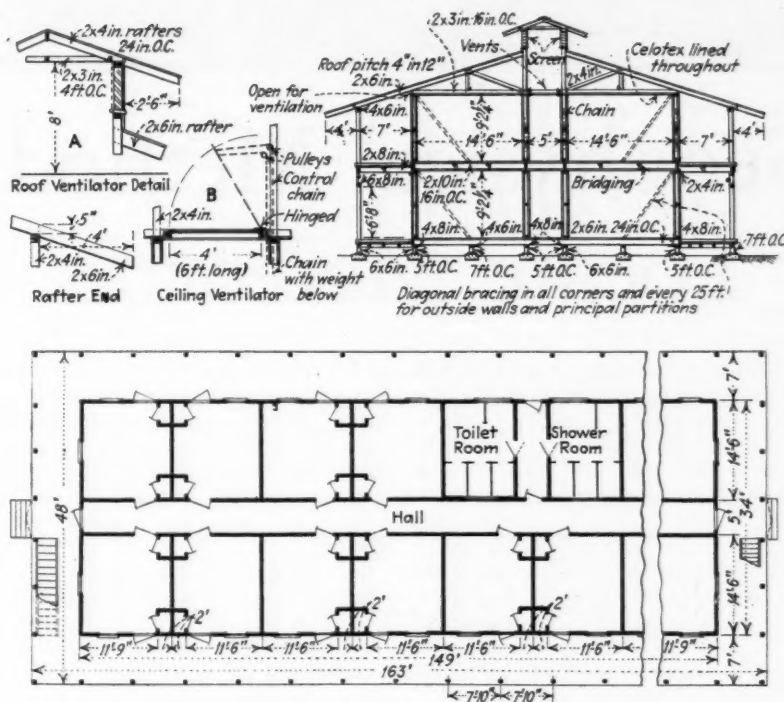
Layout of first floor of two-story bunk houses; also a cross-section showing framing details. The second floor, if any, is essentially the same.
